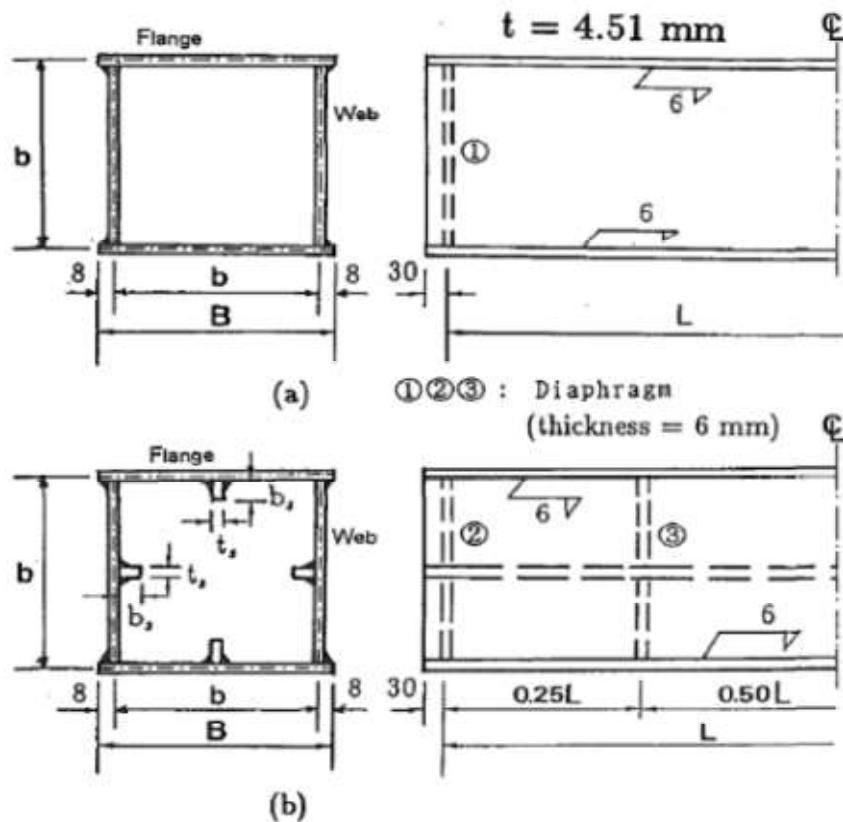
Square CFST specimens with and without stiffeners: (a) Unstiffened section; (b) Stiffened section [32]
